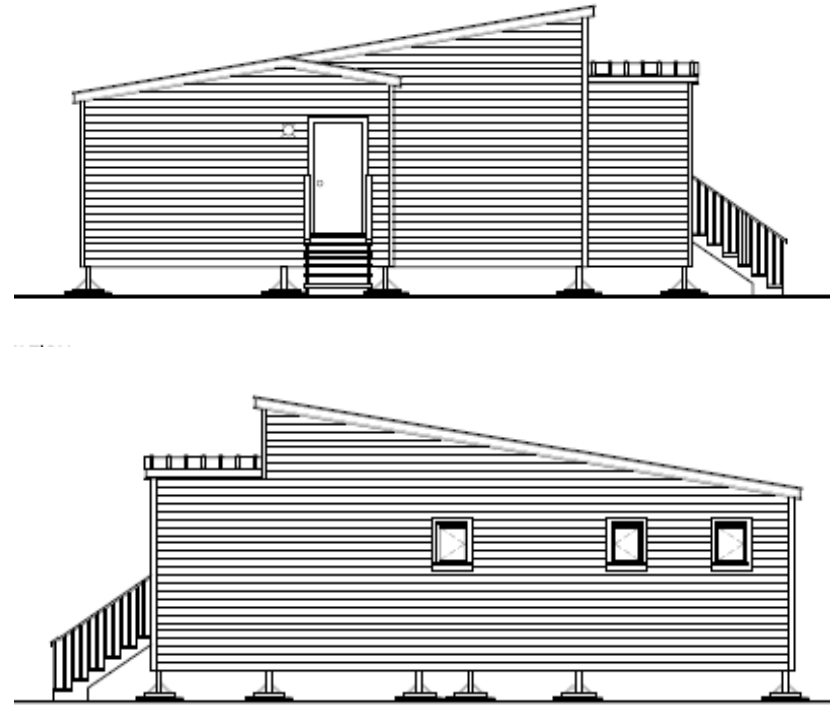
and 23: West and East Elevations of the Arviat Northern Sustainable House (Semple, 2007)
